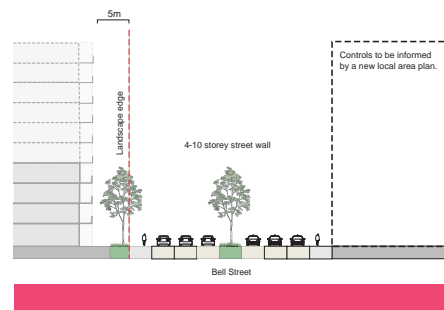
Bell Street, Bell Street Precinct. A 5m ground floor setback is proposed to manage amenity on this major road.
